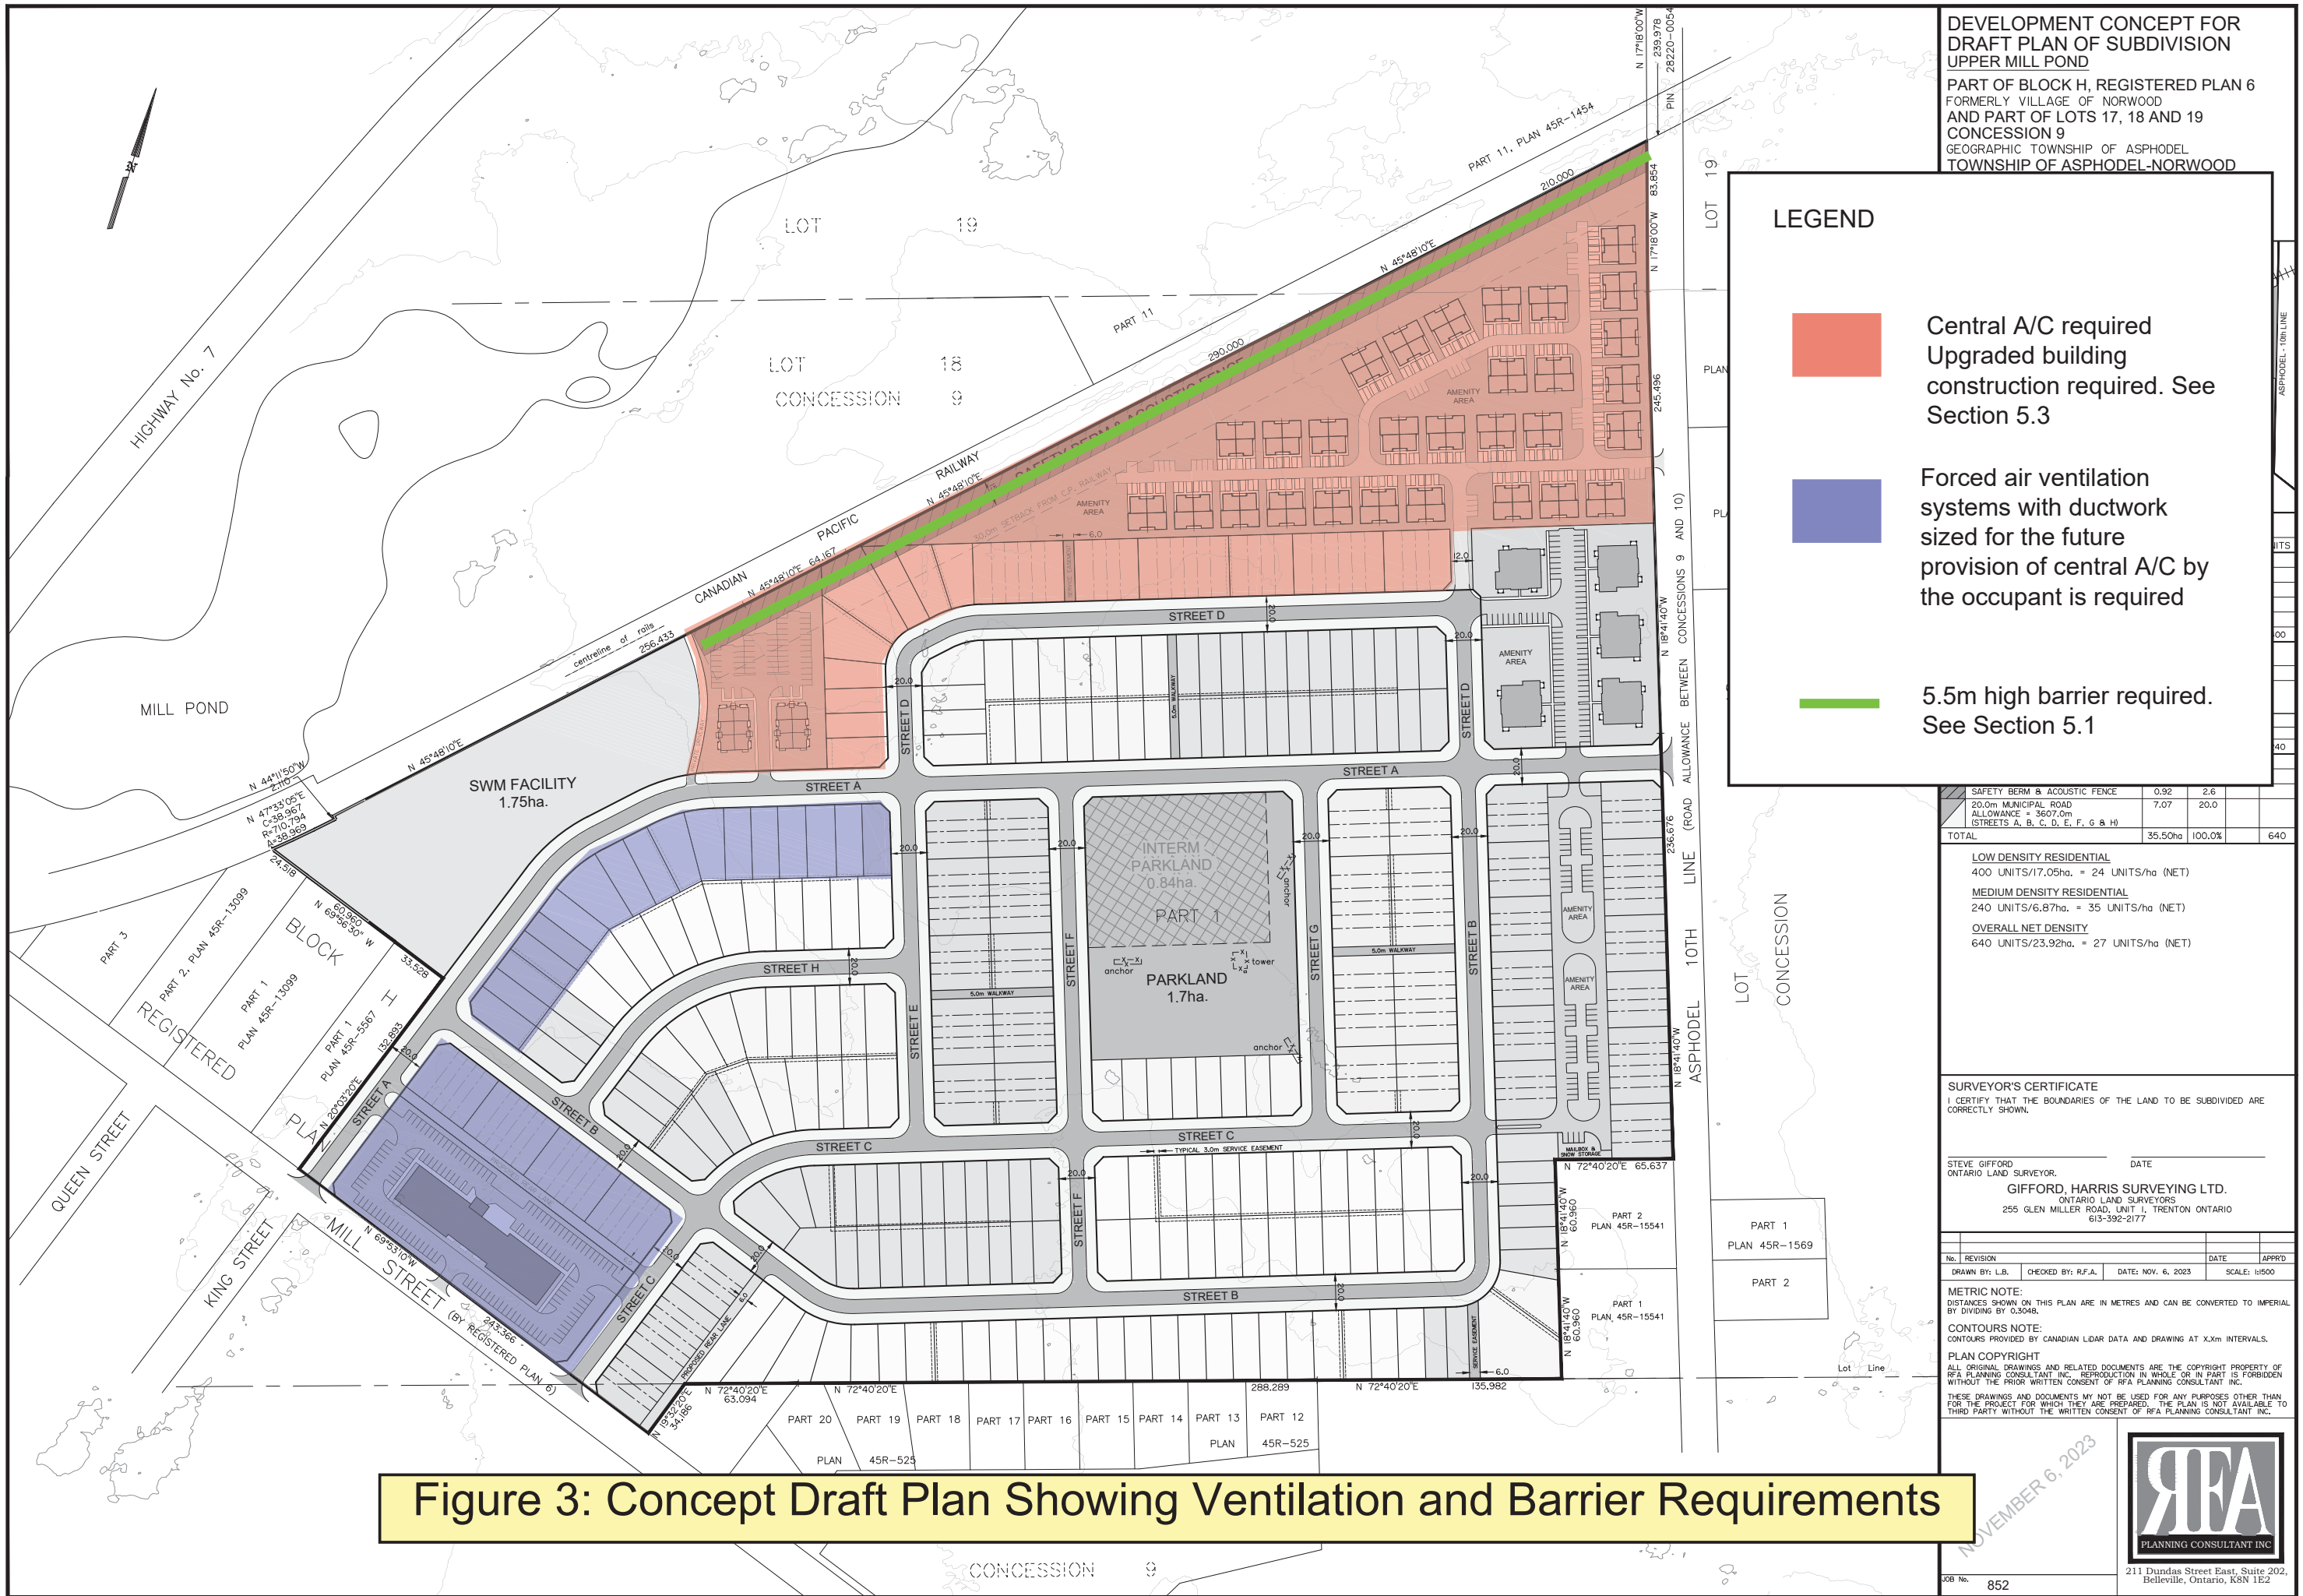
Concept Draft Plan Showing Ventilation and Barrier Requirements
